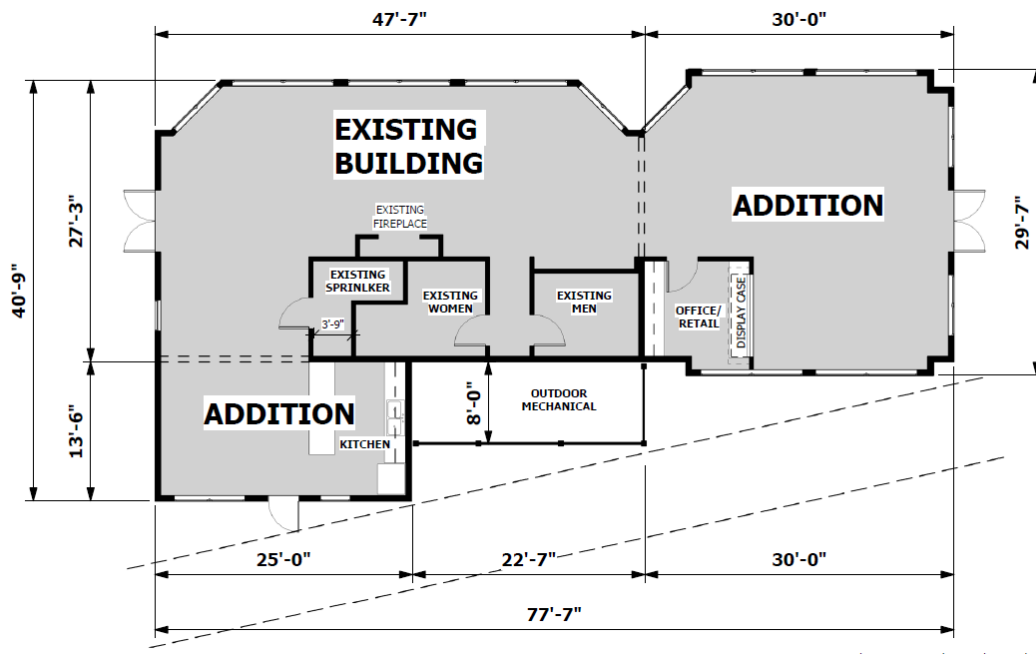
2021 Approved Paddle Hut Floor Plan
